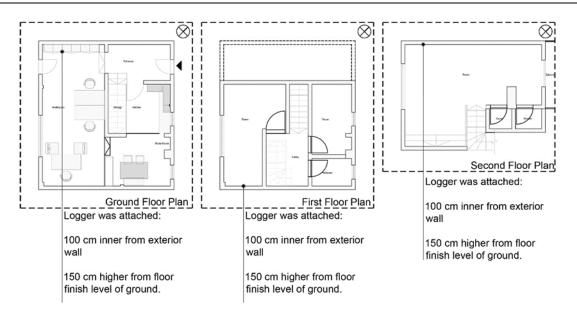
Location of data loggers and furniture layout of related rooms in building 2. The facades that measurements were taken are highlighted.
